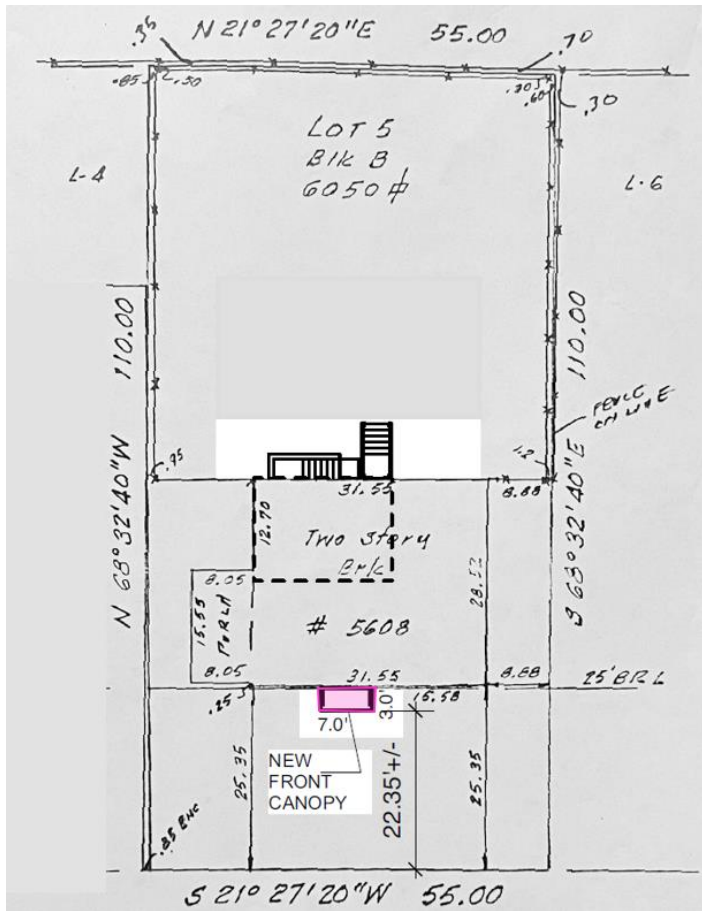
Proposed addition at 5608 36<sup>th</sup> Place, Hyattsville
